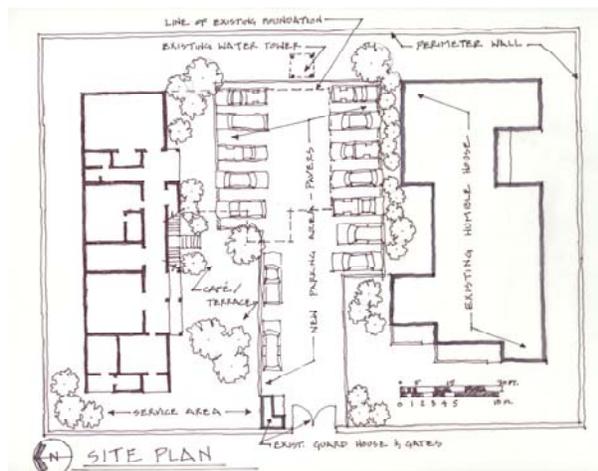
Tanzania: buildings defining central open space of the Guest House / Conference Center. Source: Fieldwork.
